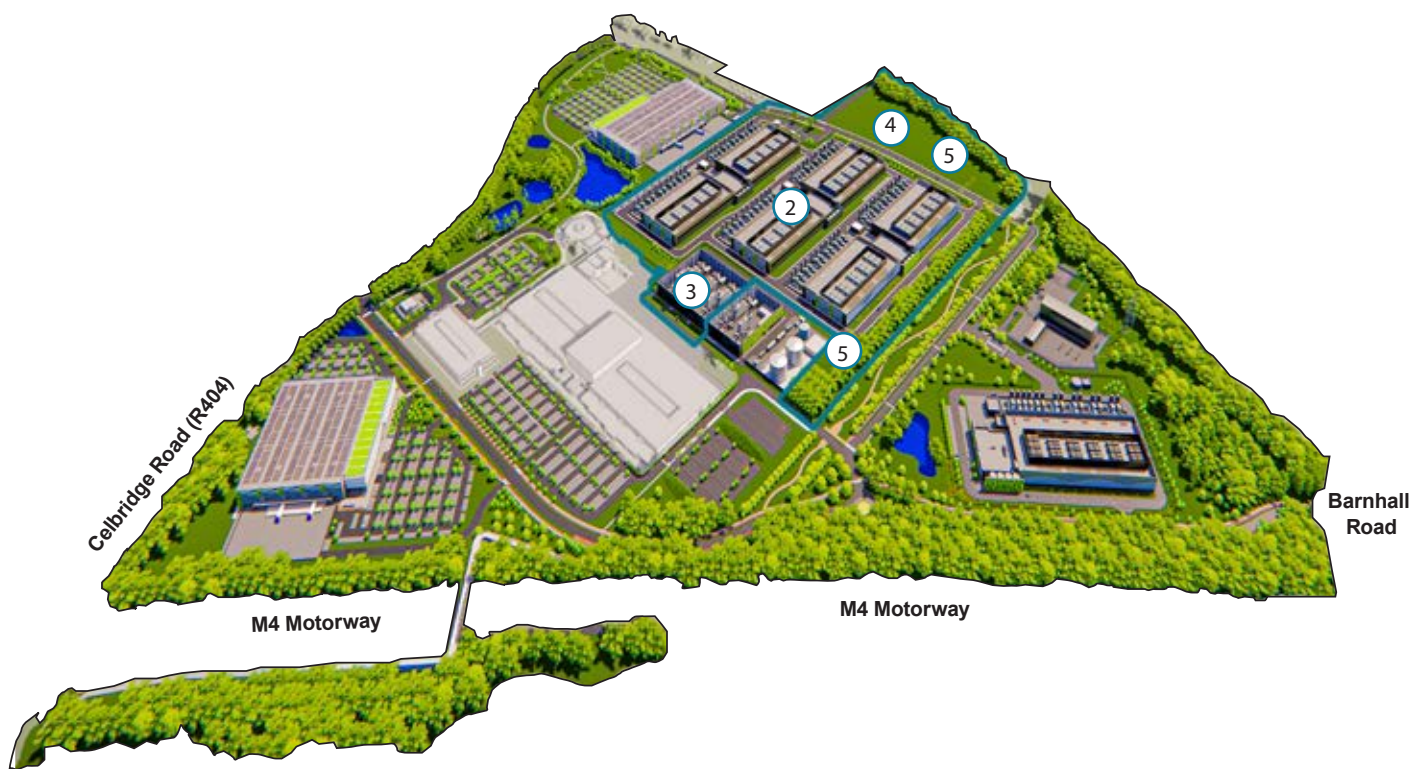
Kildare Innovation Campus Phase 3 Plan (Blue Outline). Source: RKD Architectural Design Statement
